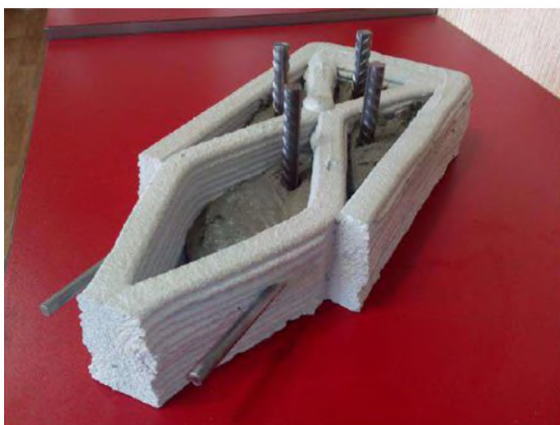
Fragment of a 3D printing structure with vertical and horizontal reinforcement with steel reinforcement [7]
